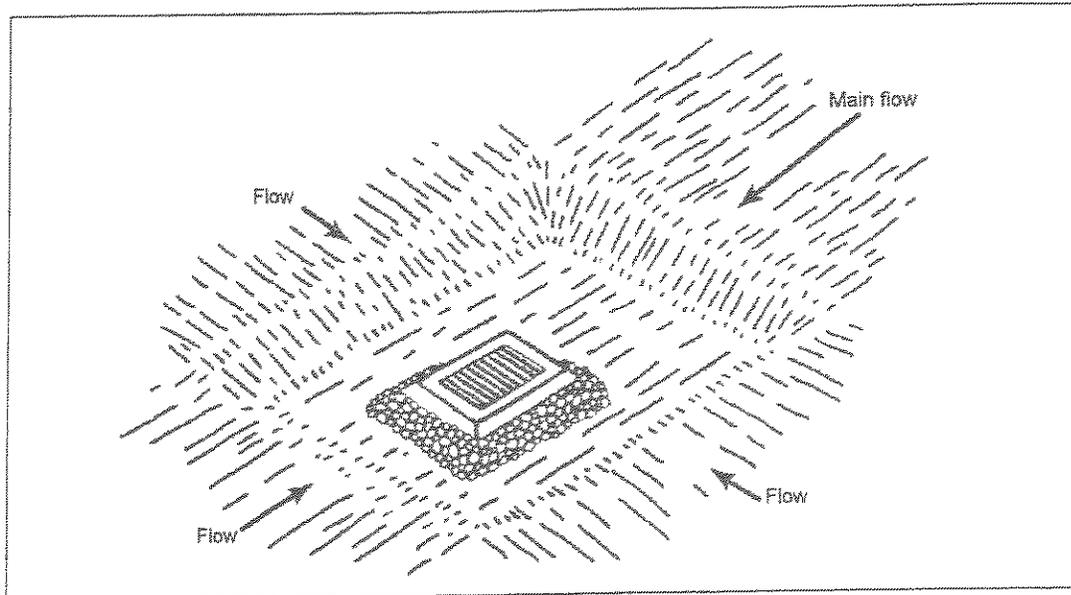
C. Perspective view of an excavated drop inlet protection.
